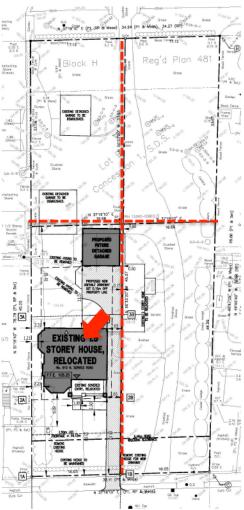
ALTERNATIVE OPTION A - Relocation of the William Hedge House on the site and subdivision of the property into 4 lots to create one new residential lot on the North Service Road and 2 new residential lots on Ribston Road.
